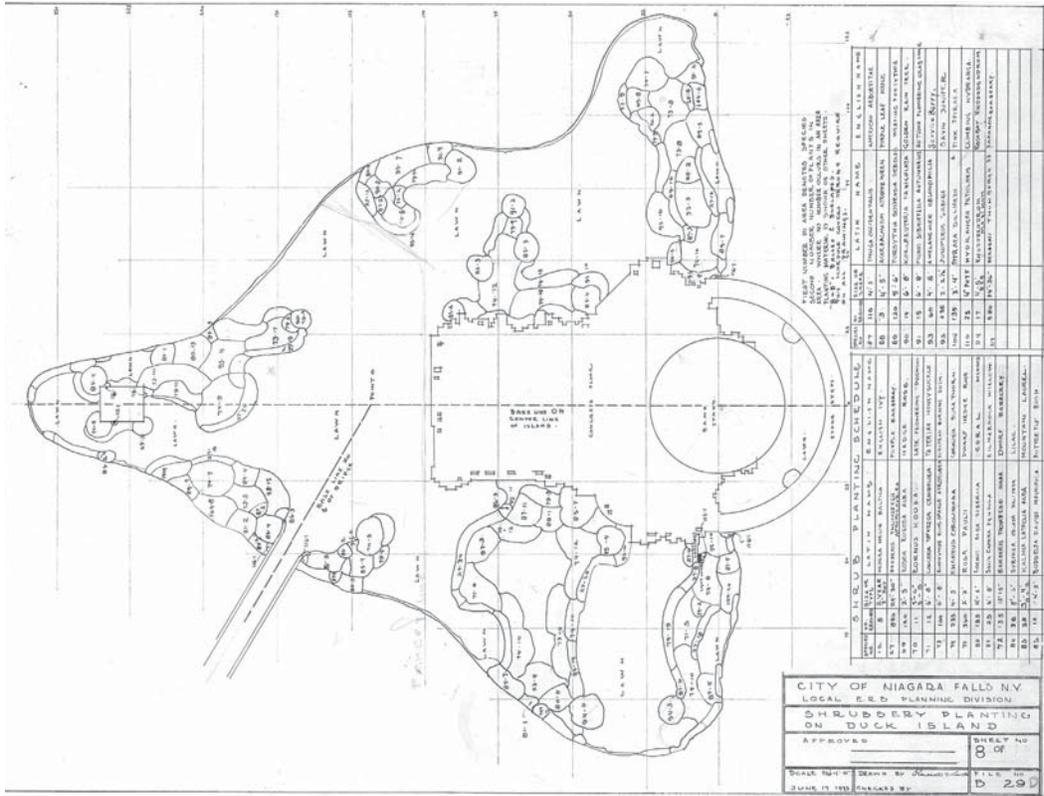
(top): Planting plan of Duck Island, 1935; Figure 29 (bottom): Layout plan for Rose Garden, 1935. Source: Niagara Falls, Archives of the City Engineer.
